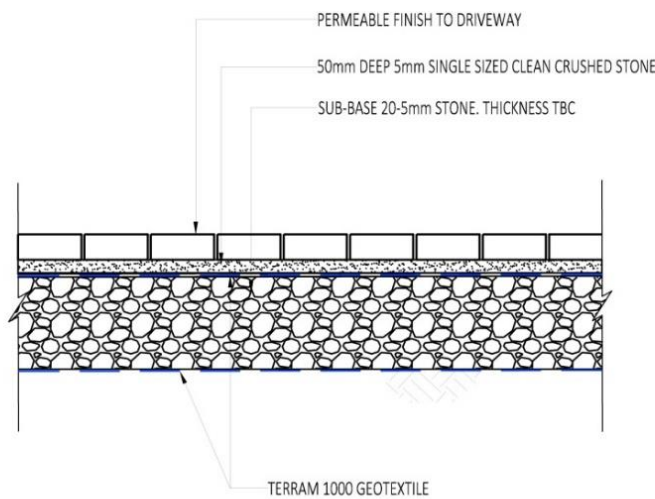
Section showing how the surface would be constructed and the proposed drainage scheme
